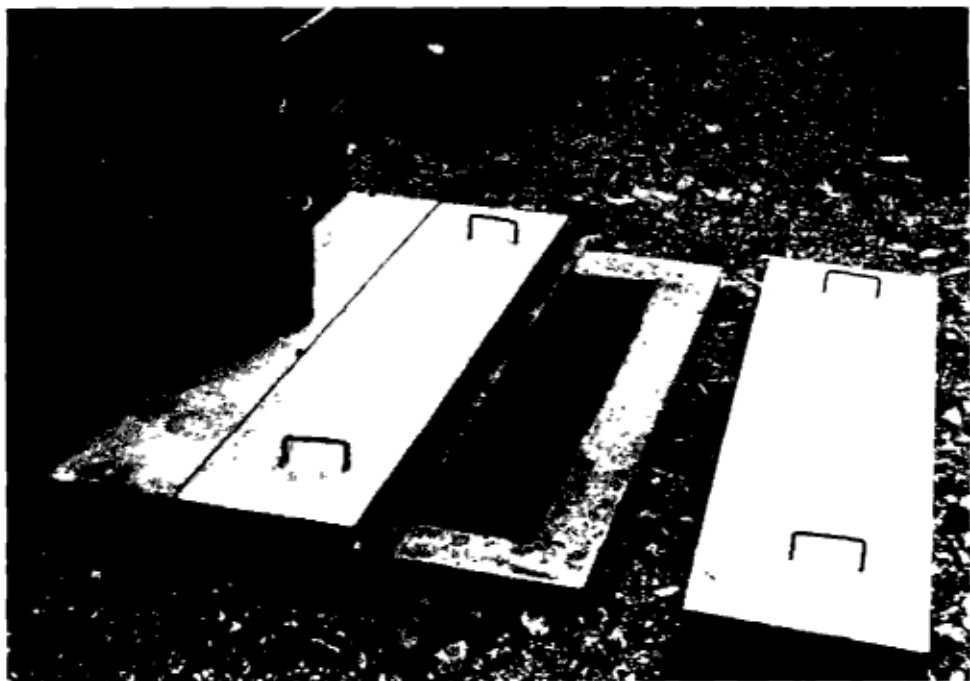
Access to one pit of an alternating twin pit VIP latrine (Photo by D. D. Mara of a pit at UK Building Research establishment. Crown Copyright reserved)
